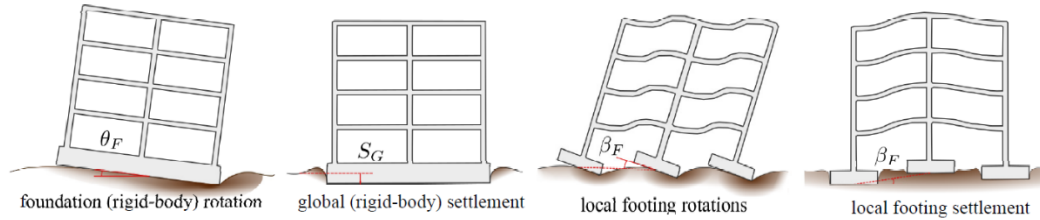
Building-Foundation combined Failure Mechanisms (Millen et al., 2019)
